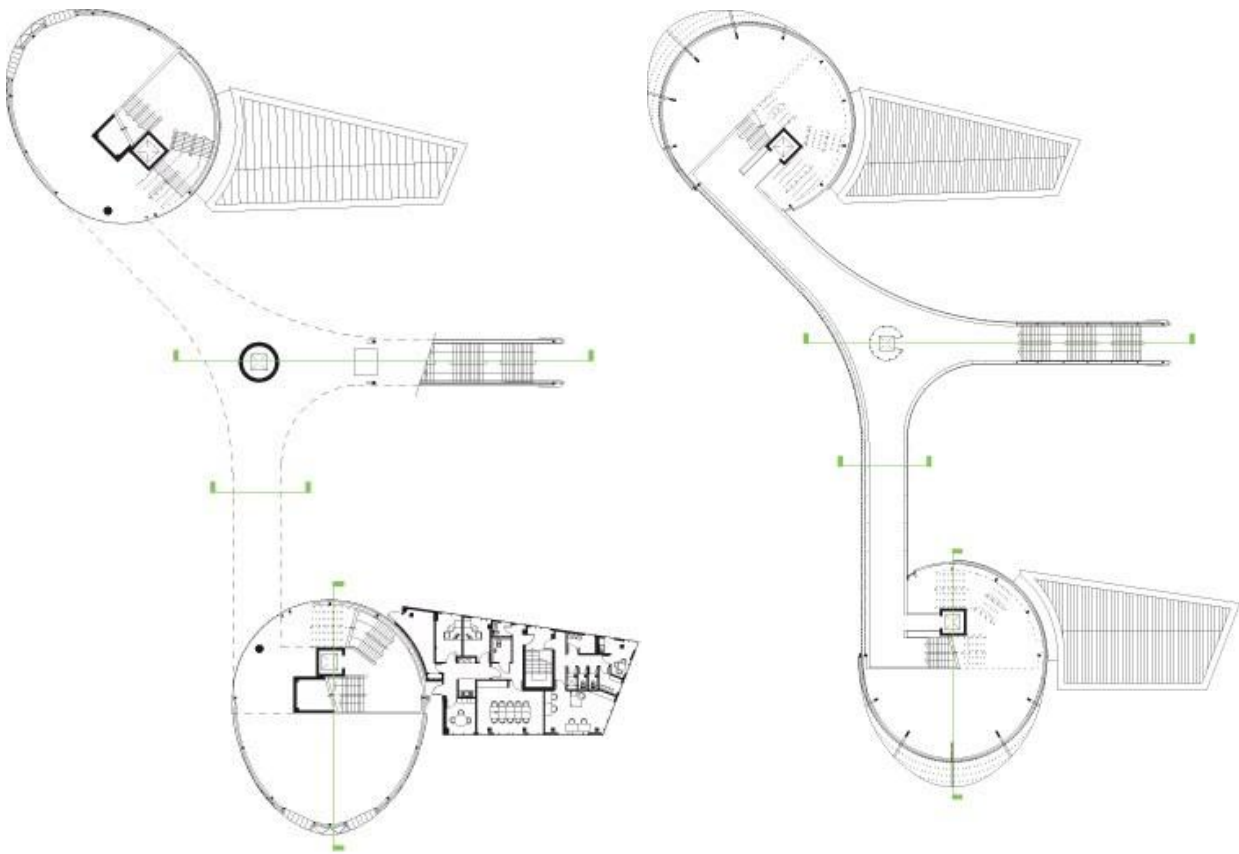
Concourse and Connecting Platform Floor Plans with Station Personnel Functions of Newport Station
